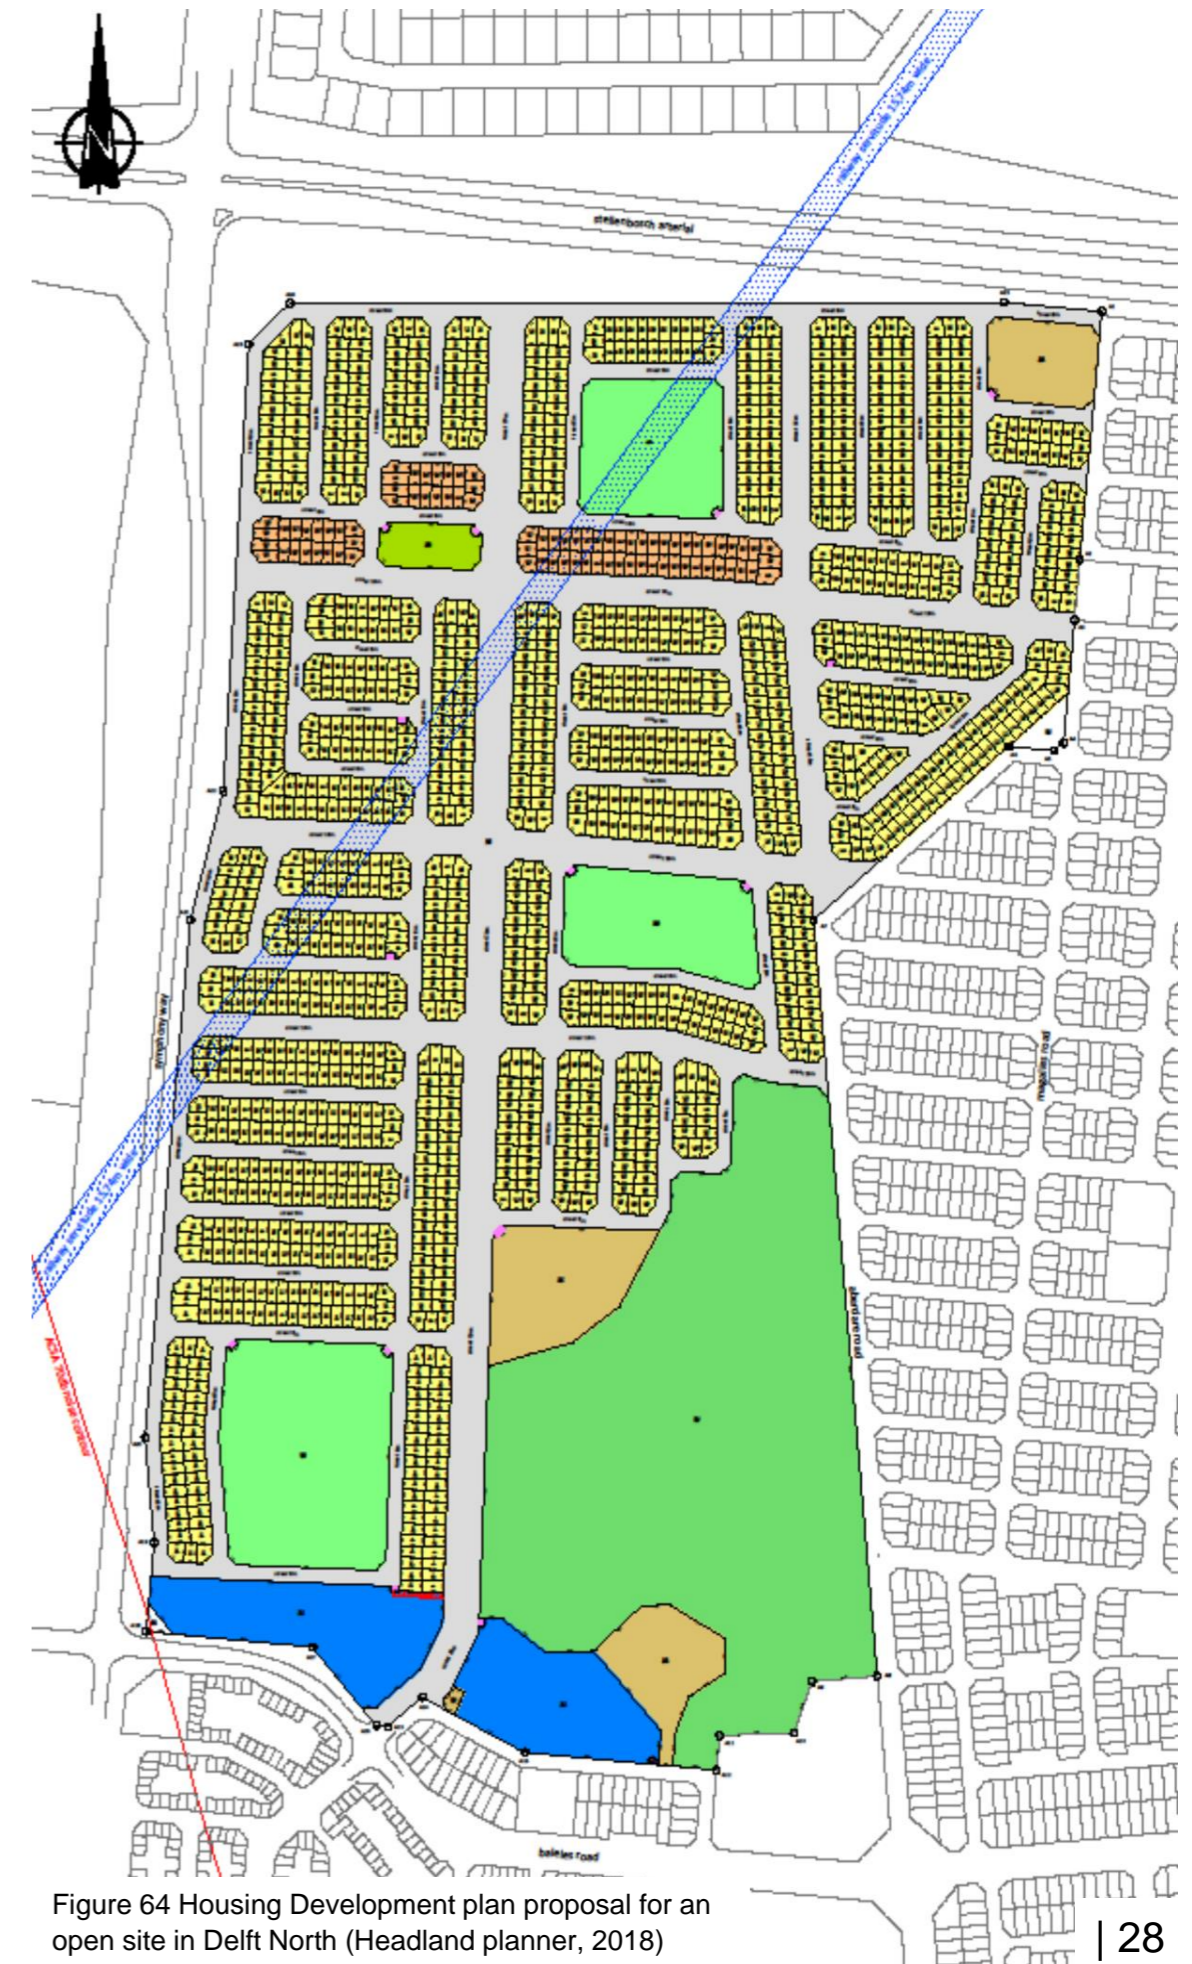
Housing Development plan proposal for an open site in Delft North (Headland planner, 2018)
